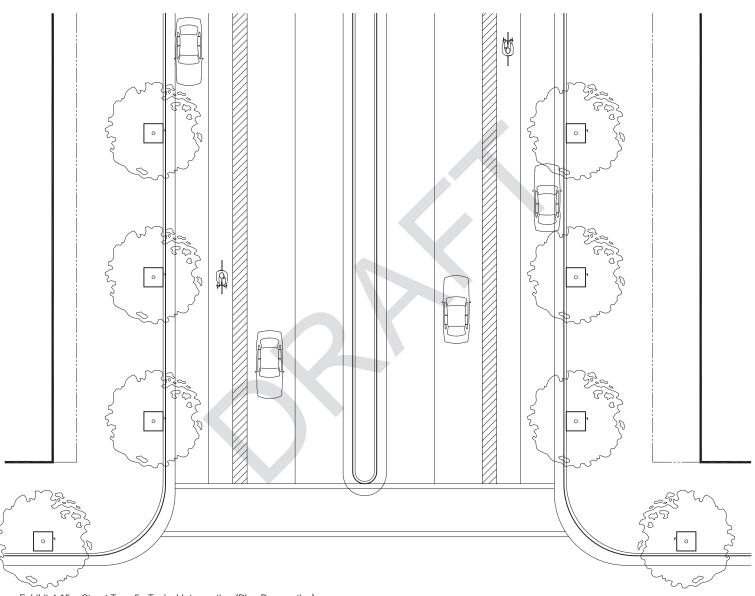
Street Type 5: Typical Intersection (Plan Perspective)
